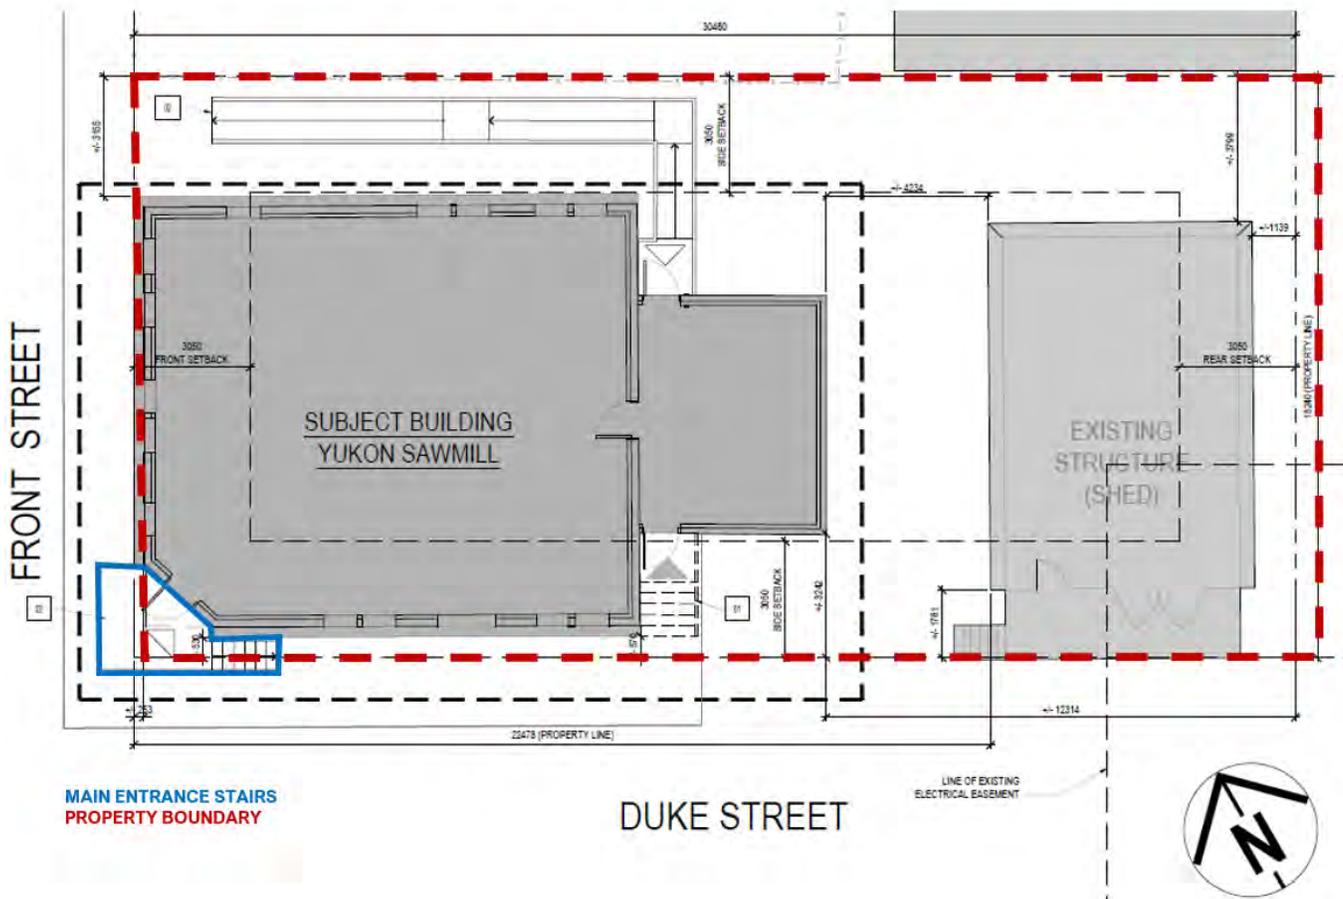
Site plan demonstrating entrance stairs overlapping City of Dawson boardwalk.
